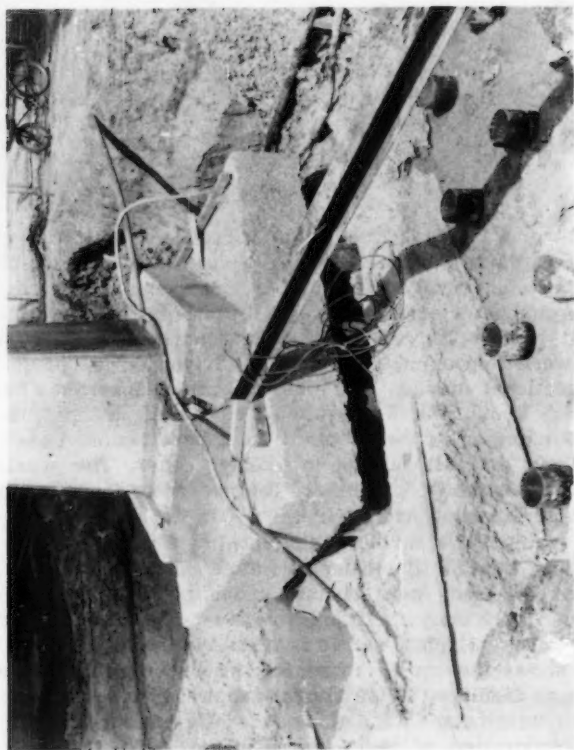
FOUNDATION—OUTSIDE CORNER RING C, 19-FOOT
